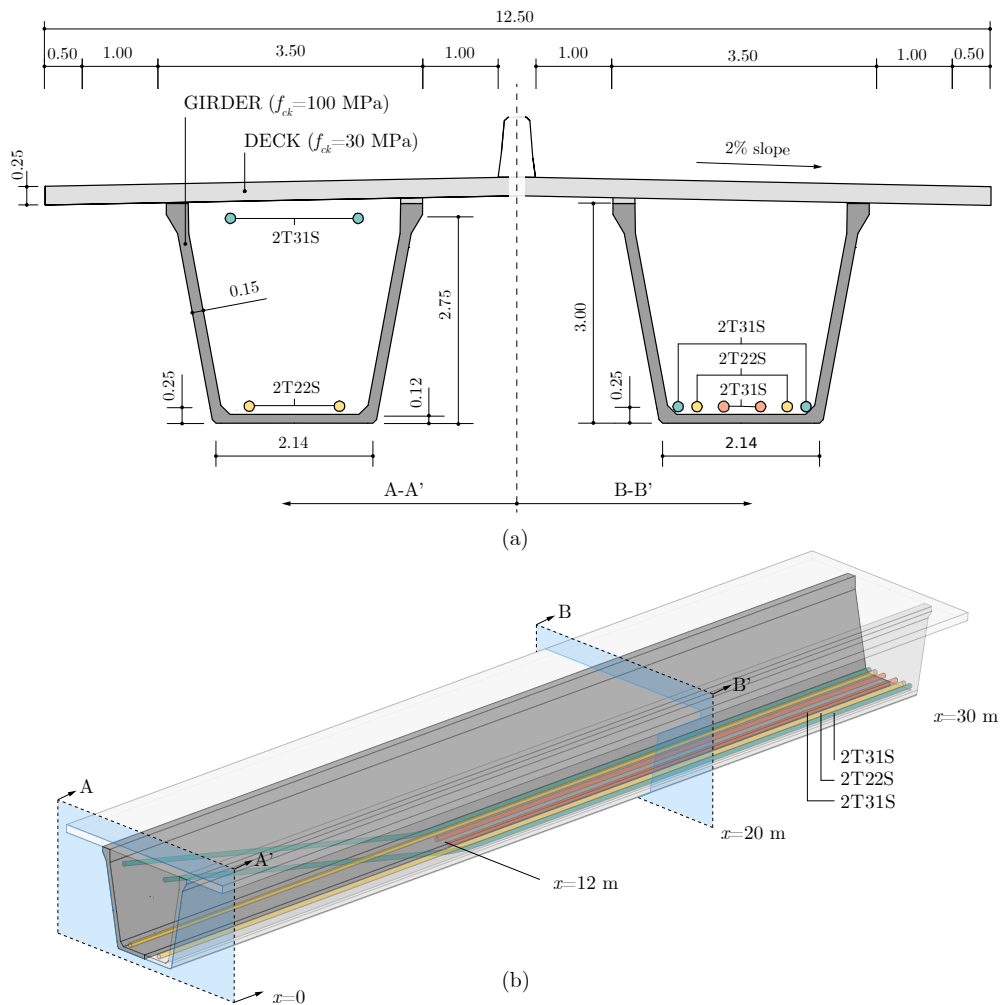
(a) Cross-section of the proposed alternative with HPFRC U-girders and conventional deck; (b) 3D representation of half HPFRC proposed bridge.
